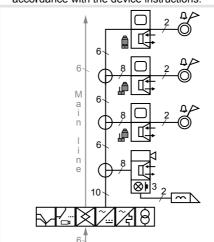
6D video - Connection of a floor station Floor push-buttons must be illuminated separately.
